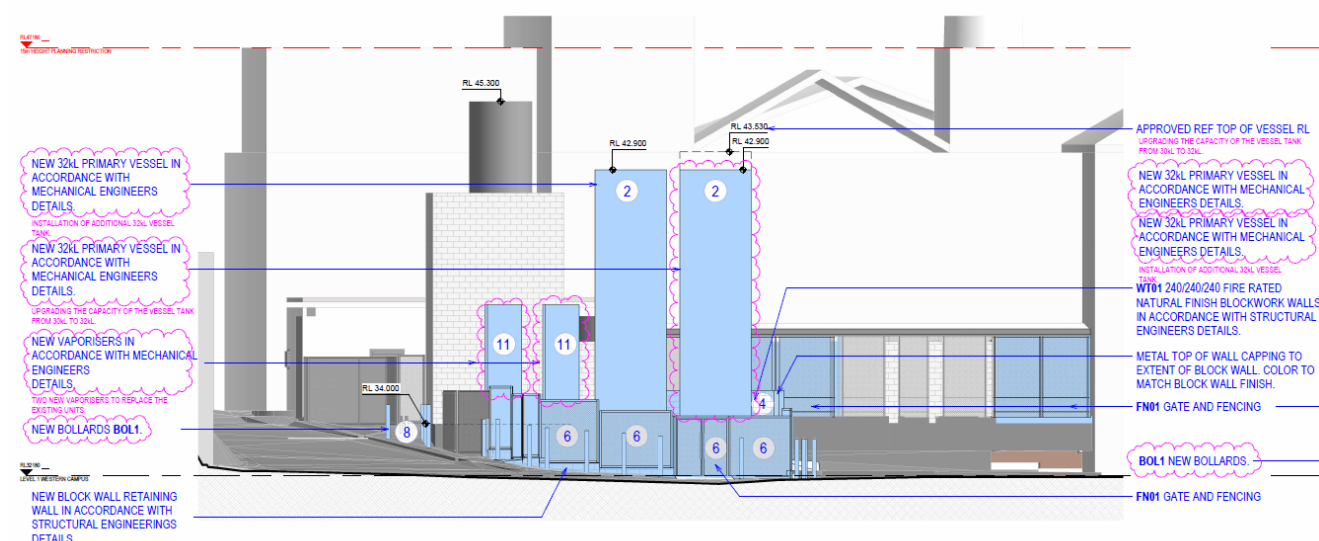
Amended Proposal - Elevation 1 (source: Jacobs dated 21 February 2025)
